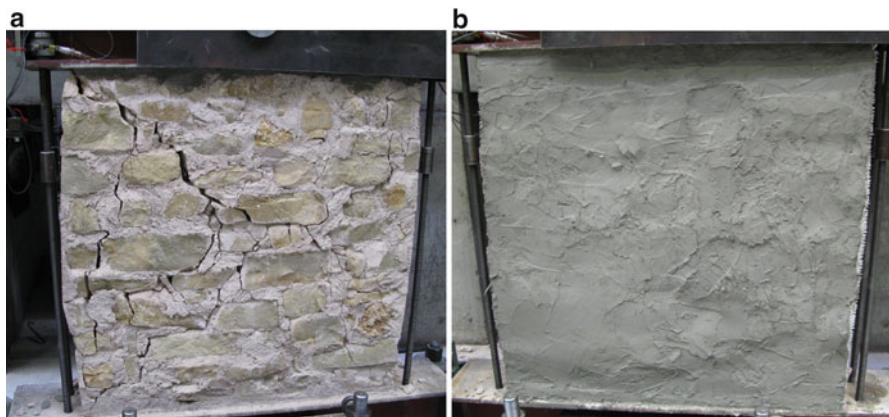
(a) Damaged URM wall; (b) damaged RM wall with fine cracks
